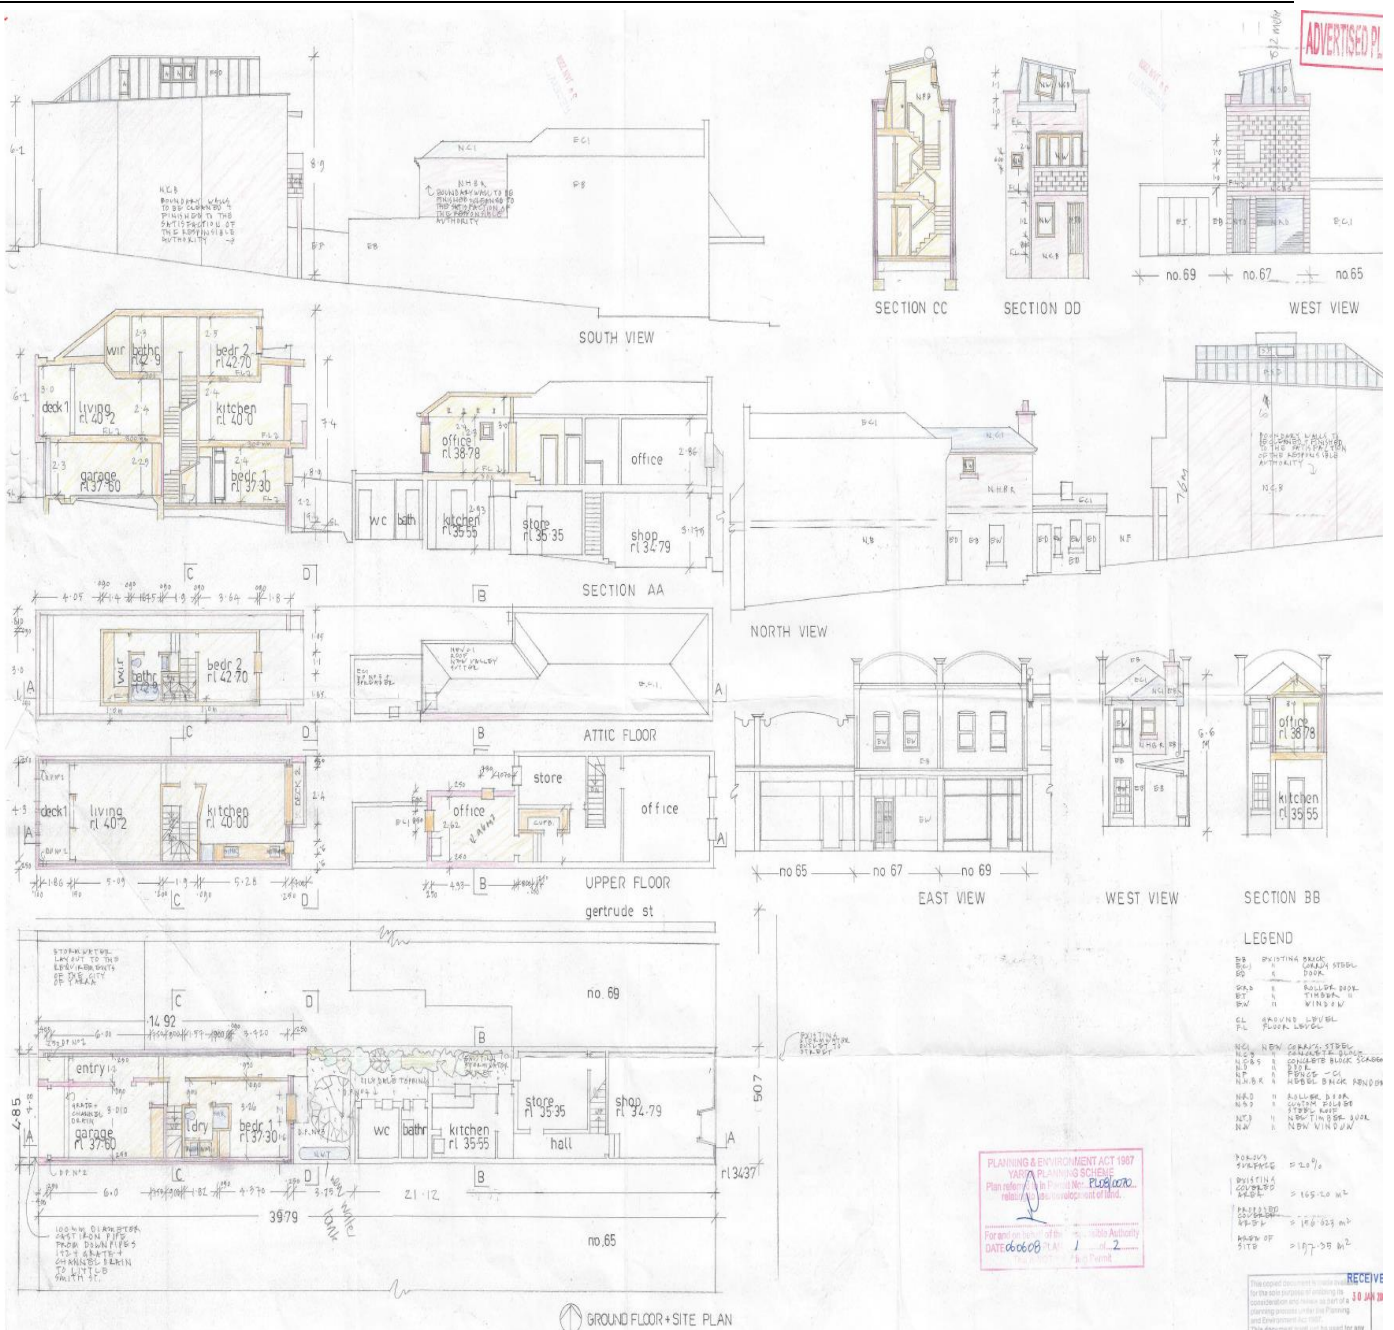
PL08/0070 No.44 Little Smith Street and No.69 Smith Street
